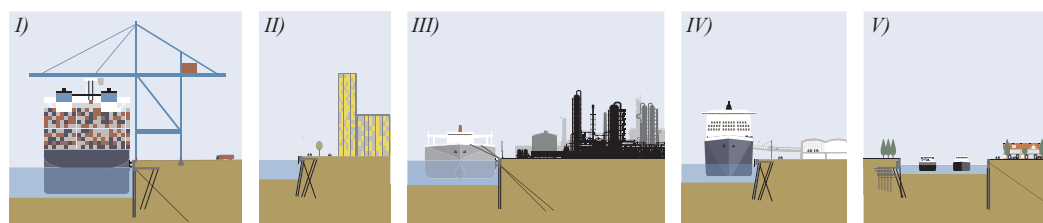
Impression of different quay wall types: I) commercial quay wall; II) quay wall in urban area; III) quay wall that is part of a dangerous plant; IV) quay wall that facilitates cruise ships; V) quay walls that facilitate main sailing routes.
